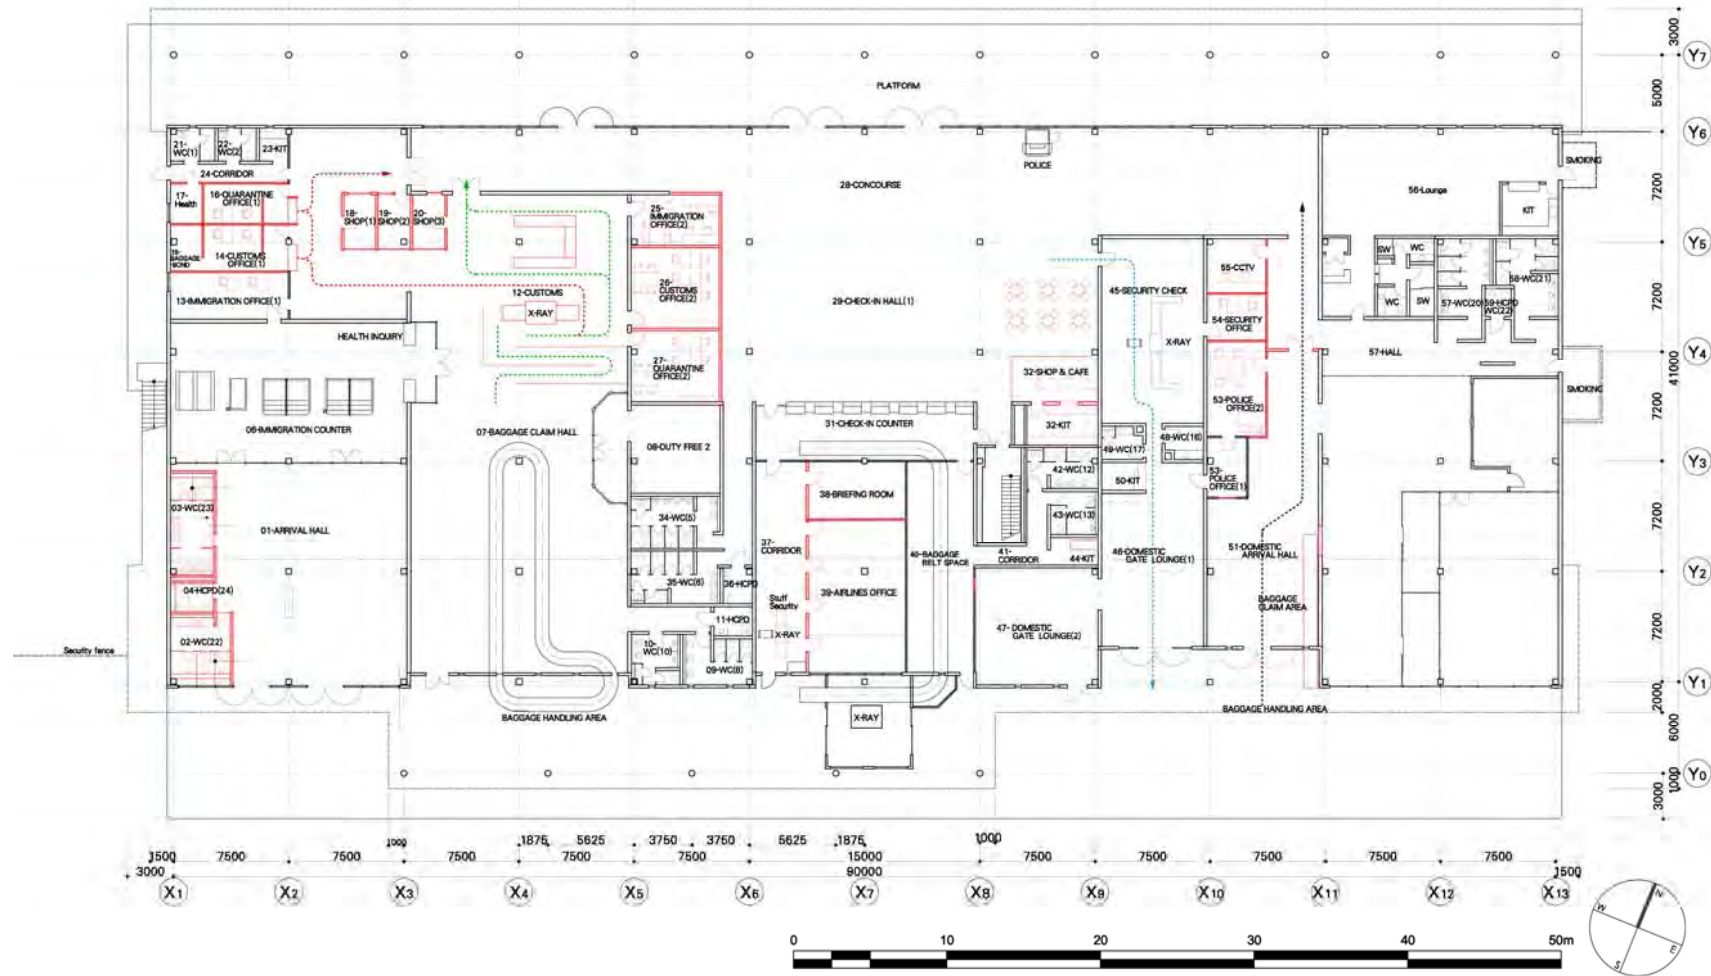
Ground Floor Renovation Layout Plan (ETB) (Red line shows new partitions)
